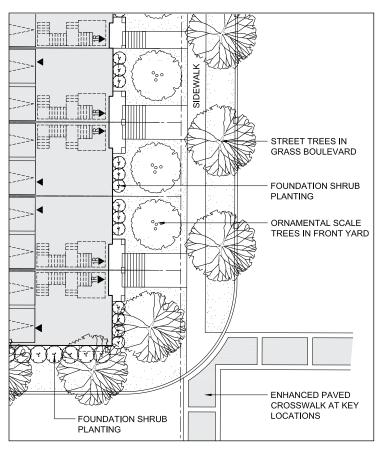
Conceptual plan of typical front yard and streetscape treatment.
